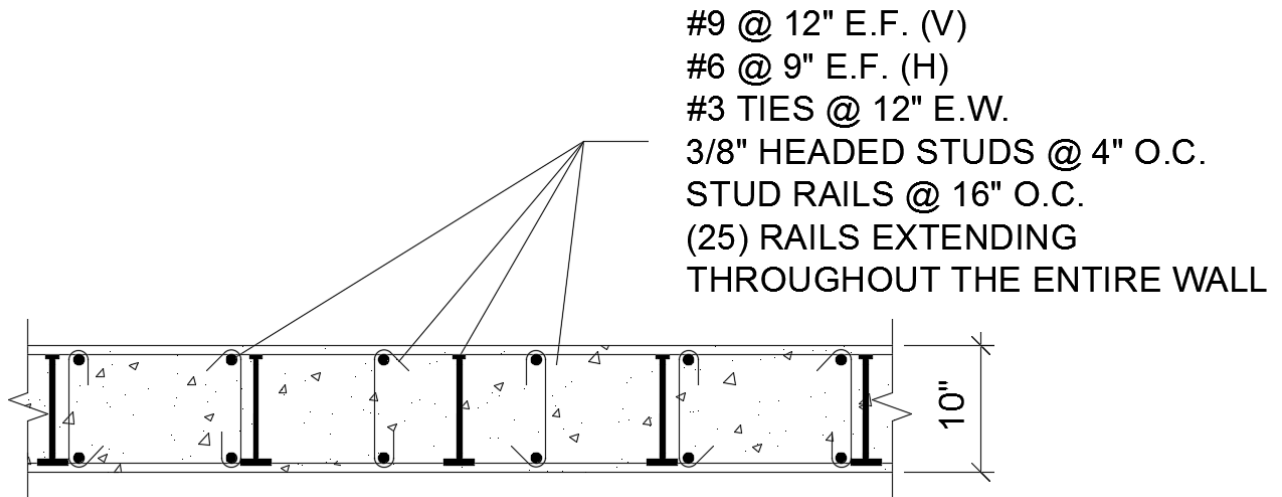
New exterior wall, cross-section at the 3rd floor level based on tsunami design requirements.
